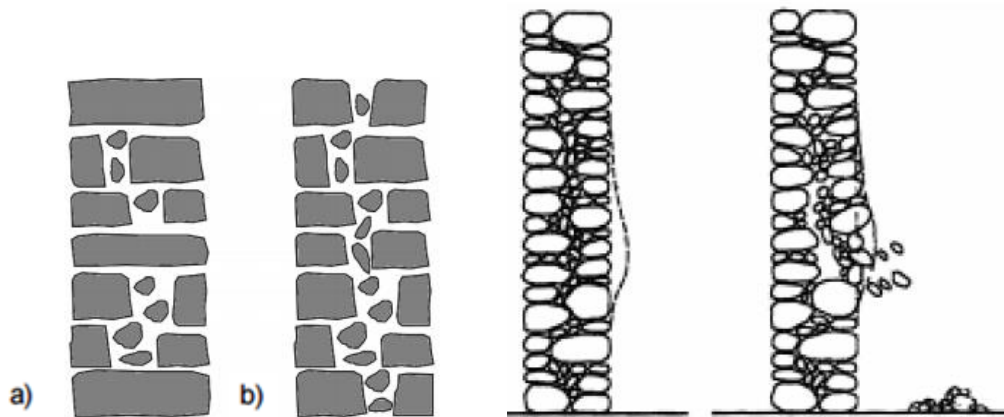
From left to right: a) example of a double leaf masonry connected by headers and b) example of a masonry fragile to earthquakes. On the right, the collapse of a double leaf masonry due to a non monolithic behaviour, subjected by horizontal or eccentric vertical forces
